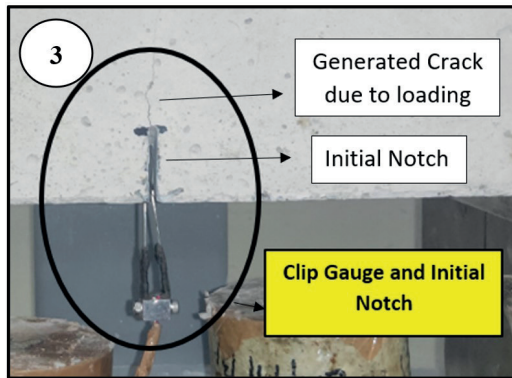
Initial notch, generated crack due to loading and clip gauge measuring CMOD
